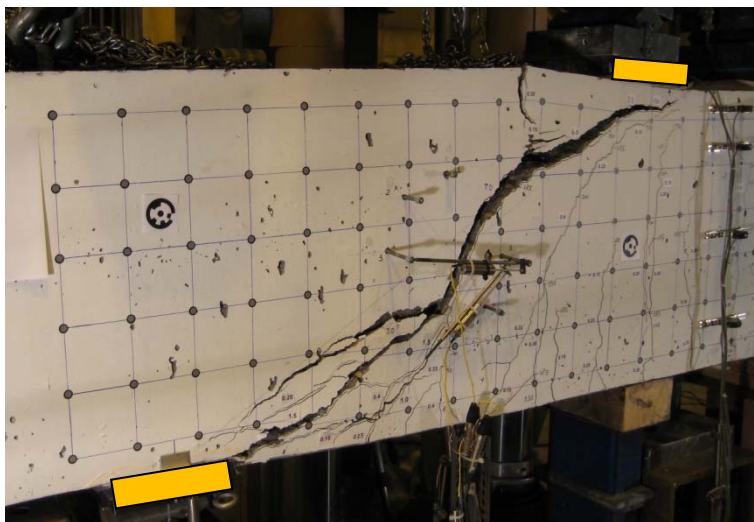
Concrete tension failure of specimen B6H. Loading and reaction plate are shown in yellow.
